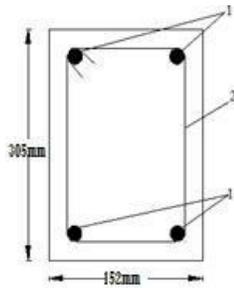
Cross section: 1 – Longitudinal rebar's, 2 – close stirrups
